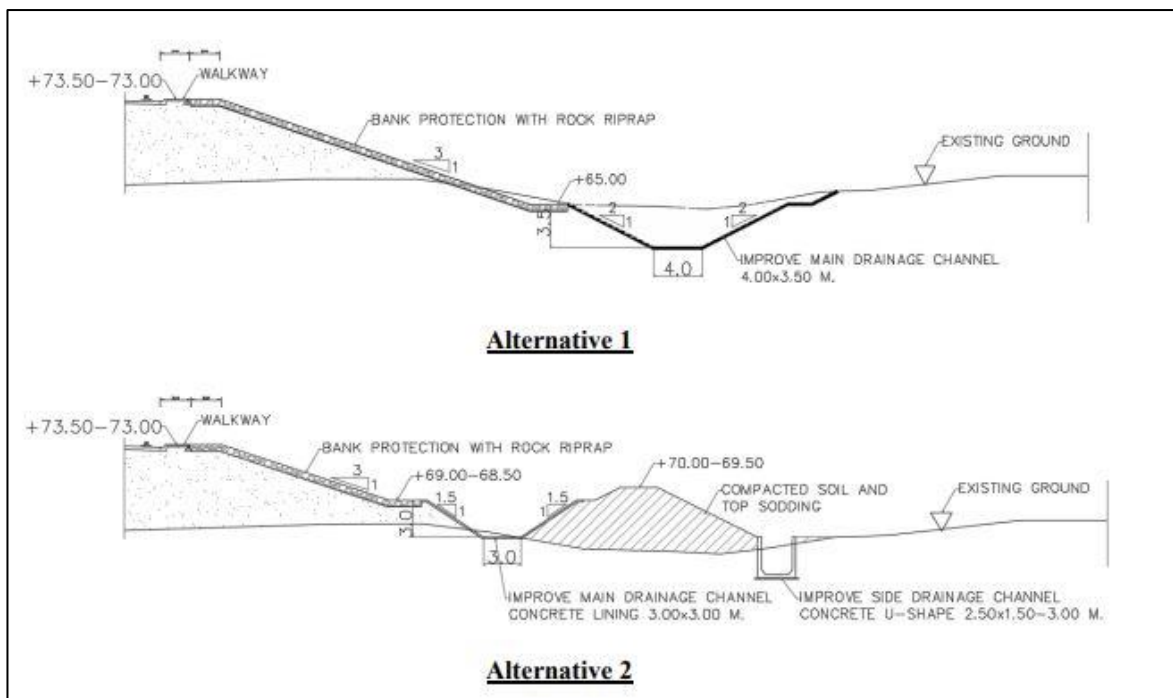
Typical Plan and Section of Main Drainage along Village
